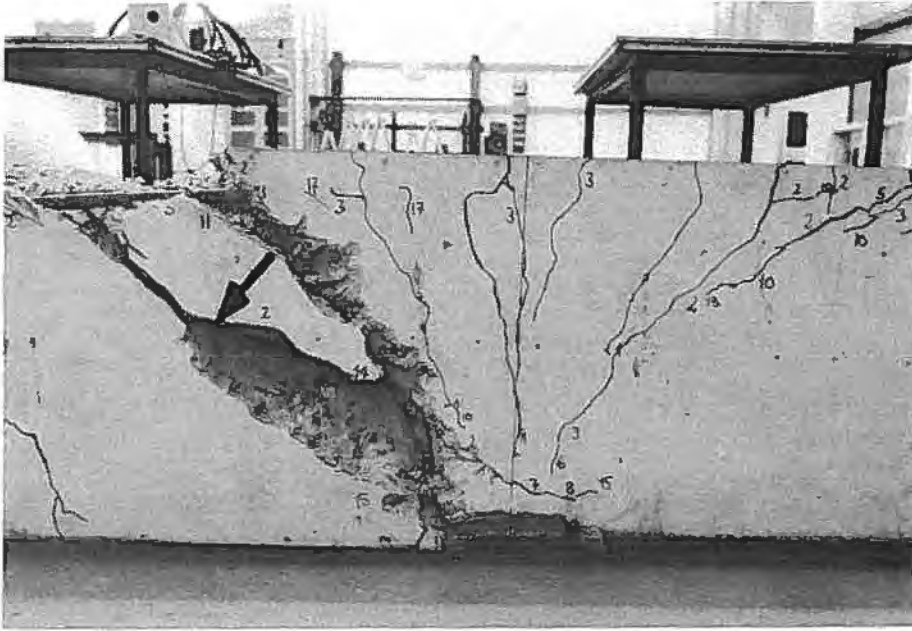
Failure of the stirrups. The arrow shows the position of the fracture.
